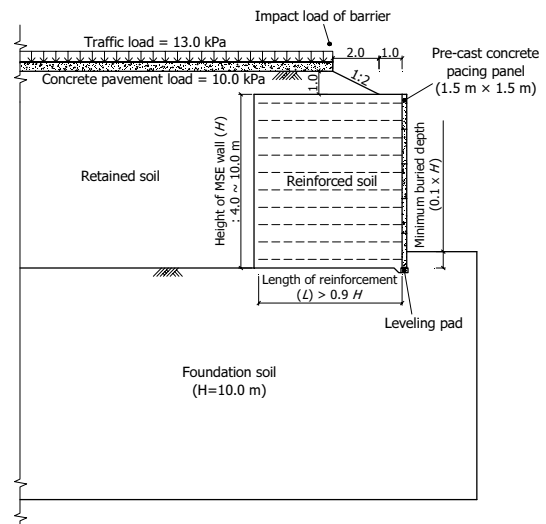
The cross-section view of MSE wall on the IPM Bridge
